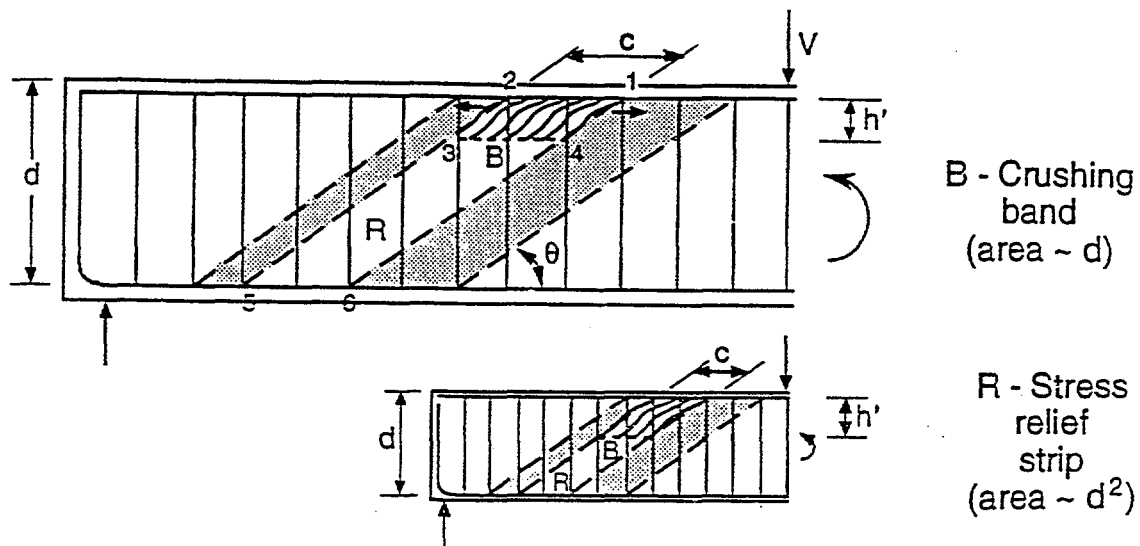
Fracture adaptation of truss model for diagonal shear failure of reinforced concrete beams: Compression crushing zone and energy release zone in beams of different sizes (after Bažant 1996).
